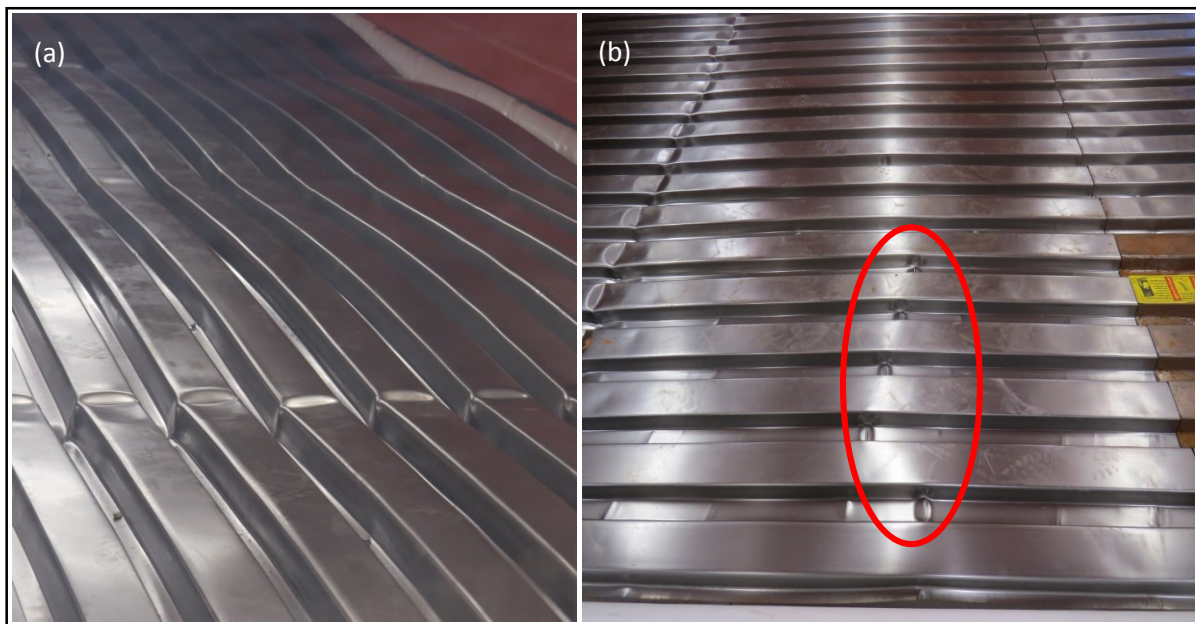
a) Steel deck failure (buckled), b) Detail of buckling failure between the fastener rows at 135 psf
